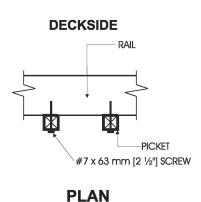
Exterior Connection: Infill Picket Nailed to Rail
